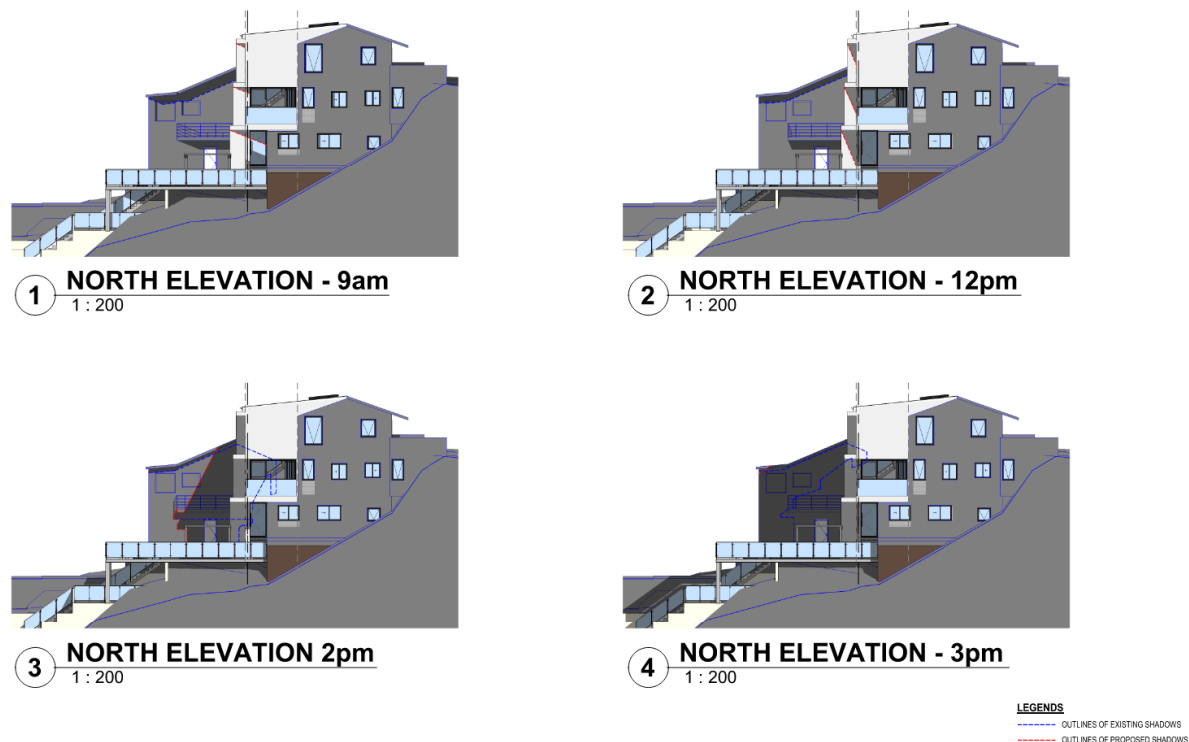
Existing and proposed elevation shadow diagrams on 21 June
